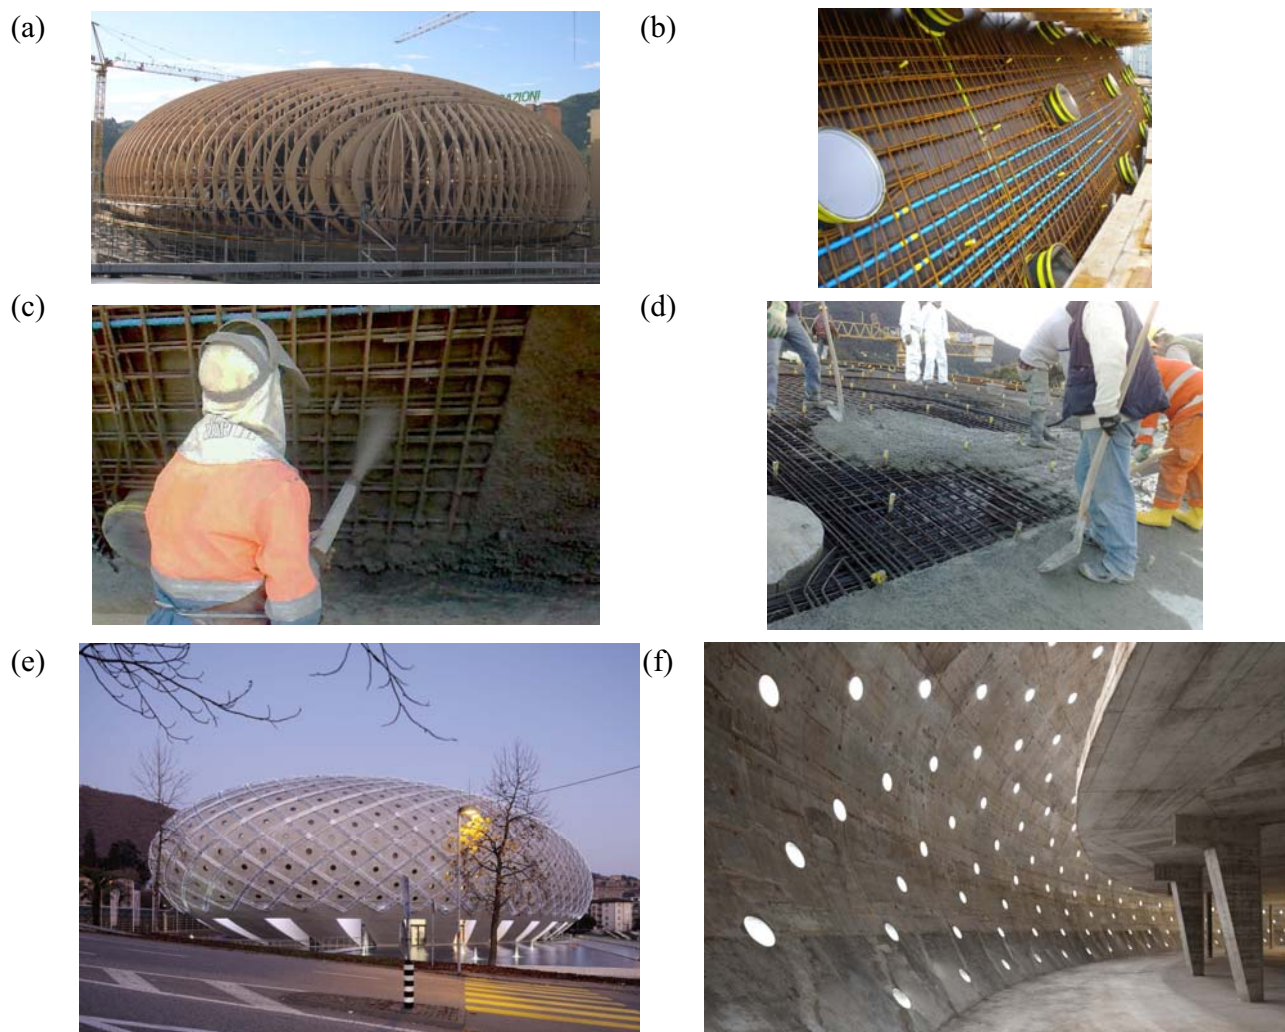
Construction of the shell: (a) temporary scaffolding; (b) placing of prestressing tendons; (c) spraying of concrete; (d) pouring of concrete; and (e-f) completed work
